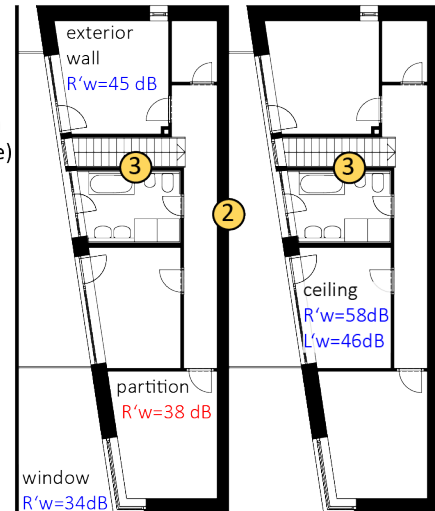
Terraced Houses Zruč – acoustics on 1<sup>st</sup> floor (left) and 2<sup>nd</sup> floor (right) (1:250) (source: author)
